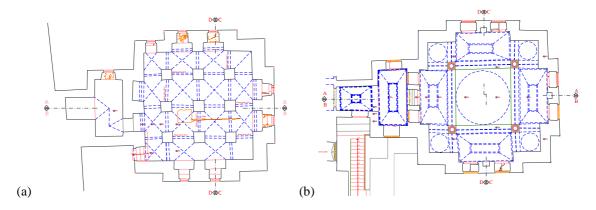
Plans of the building a) Basement Plan b) Ground Floor Plan
